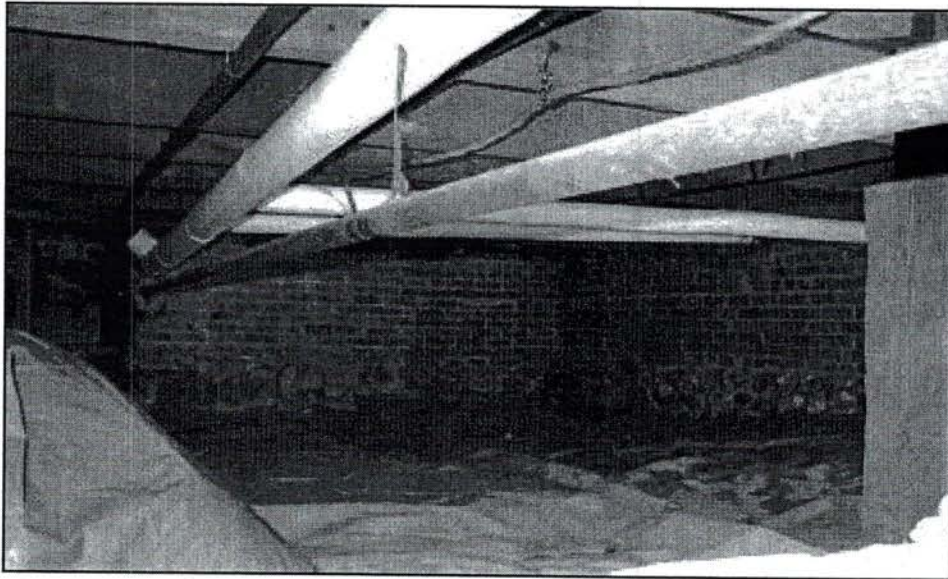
View looking northwest into the crawlspace under the rear ell. The foundation is rubble stone to grade and brick laid in a common bond above.
